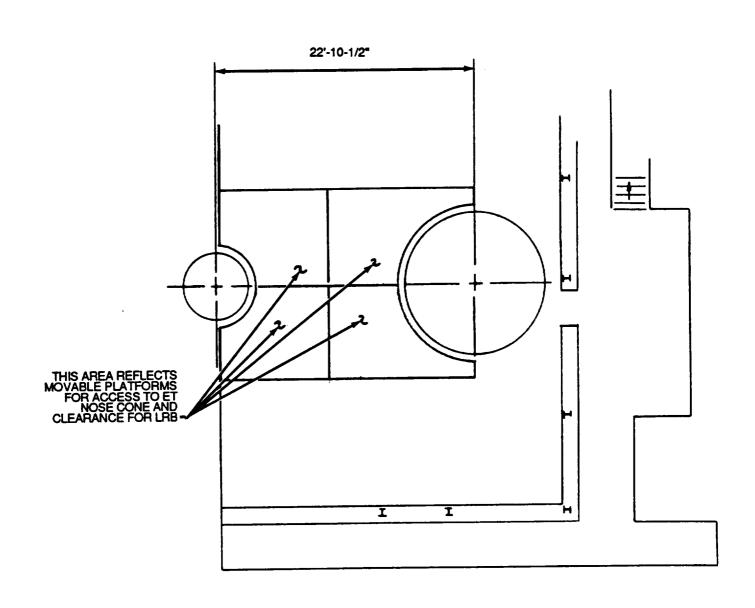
2nd Floor - Platform 'C'.
